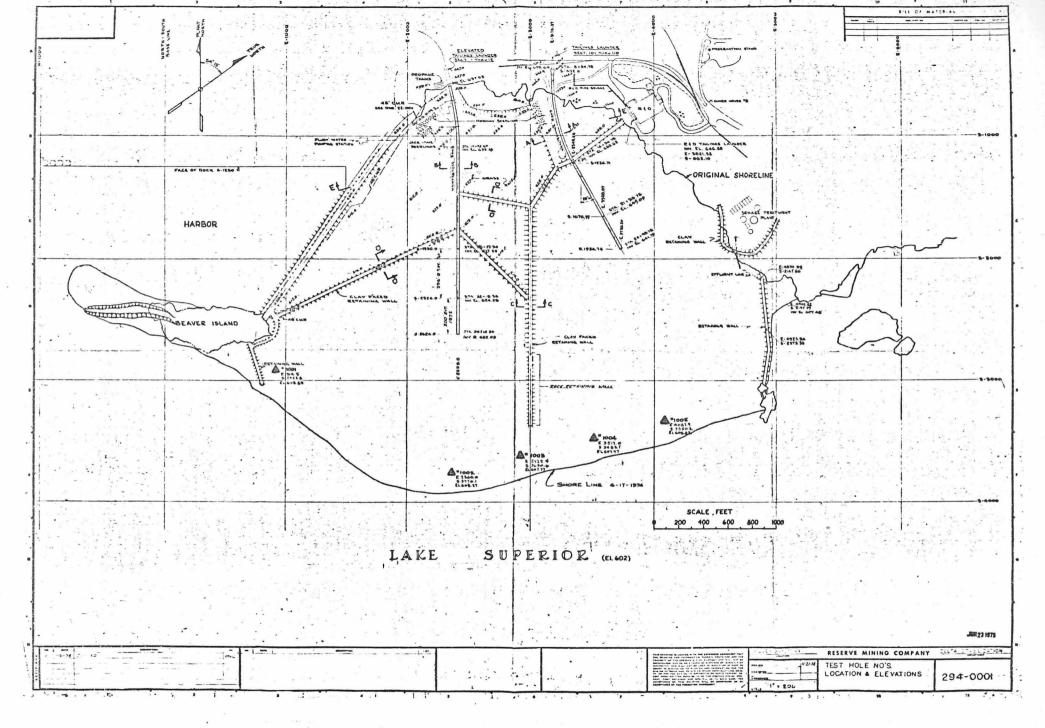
LOCATION PLAN OF BORINGS ON TAILINGS DELTA
